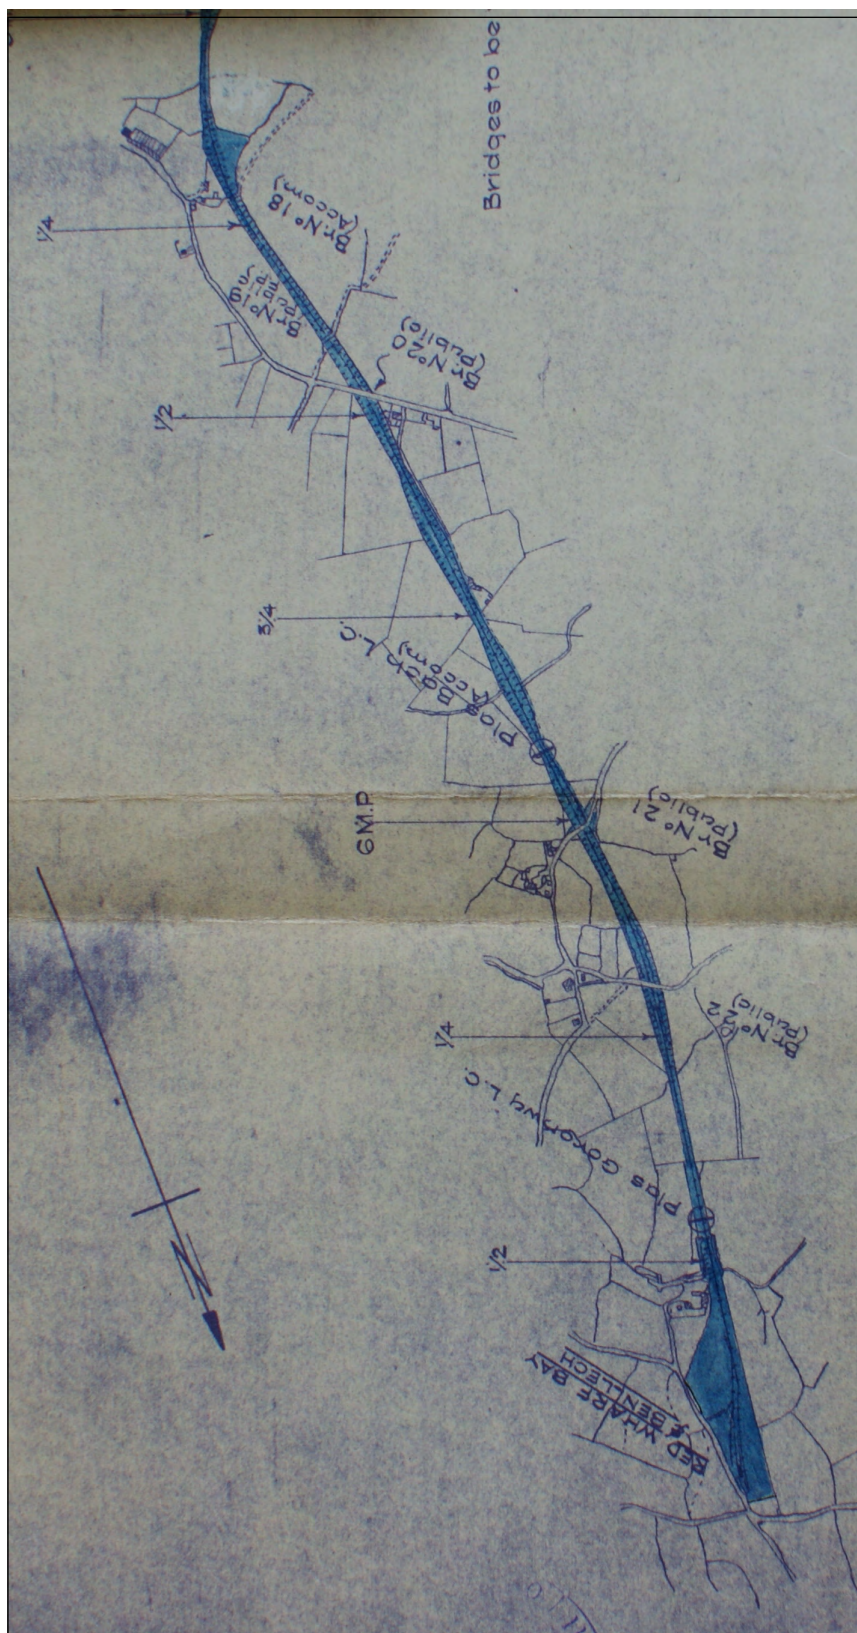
& 15. L.N.W.R Red Wharf Bay Station Plan Dated 1951 Detailing Salvage Plans for the Station Following The Decommissioning of the Line. Source & Copyright Flintshire Archives
